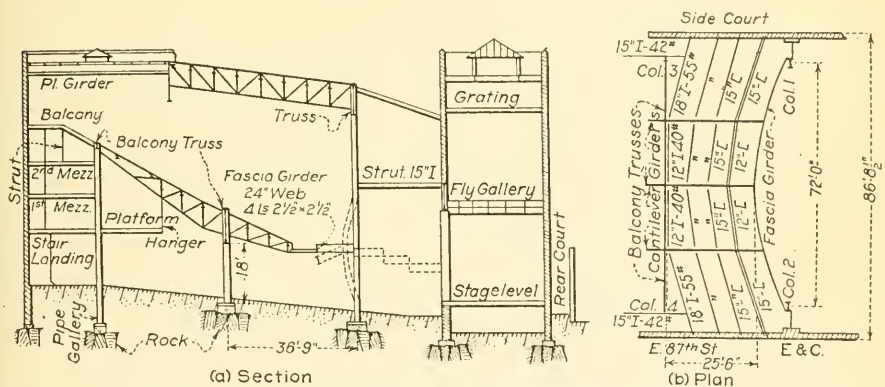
Section and Part Plan of Orpheum Theater, New York, Showing Type of Construction and Manner of Failure.
